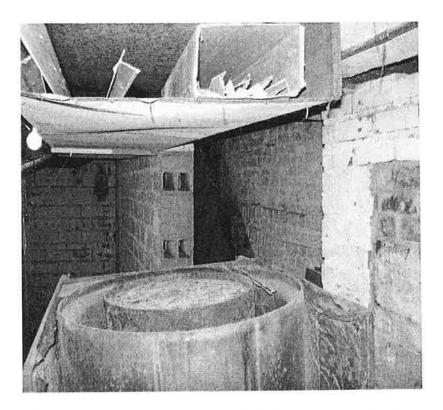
t addition south and intermediate bearing wall at infilled coal/stair shaft.
